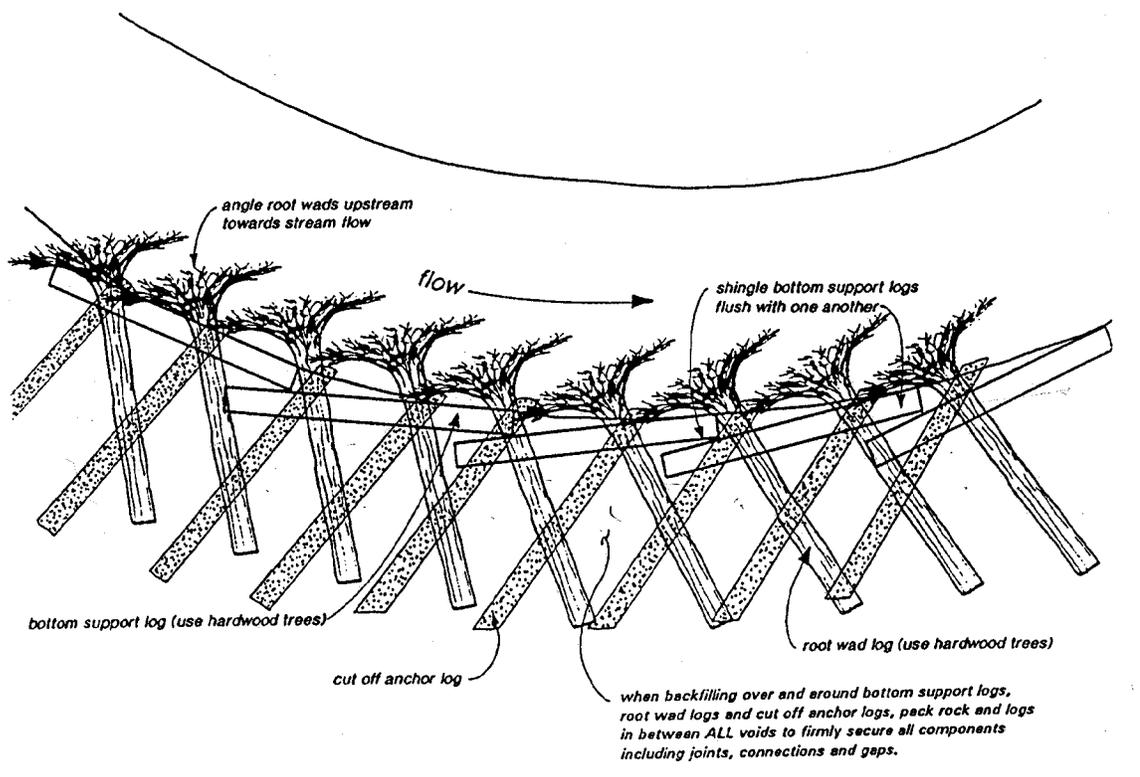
Schematic of root wad construction (from Bowers, 1992).
